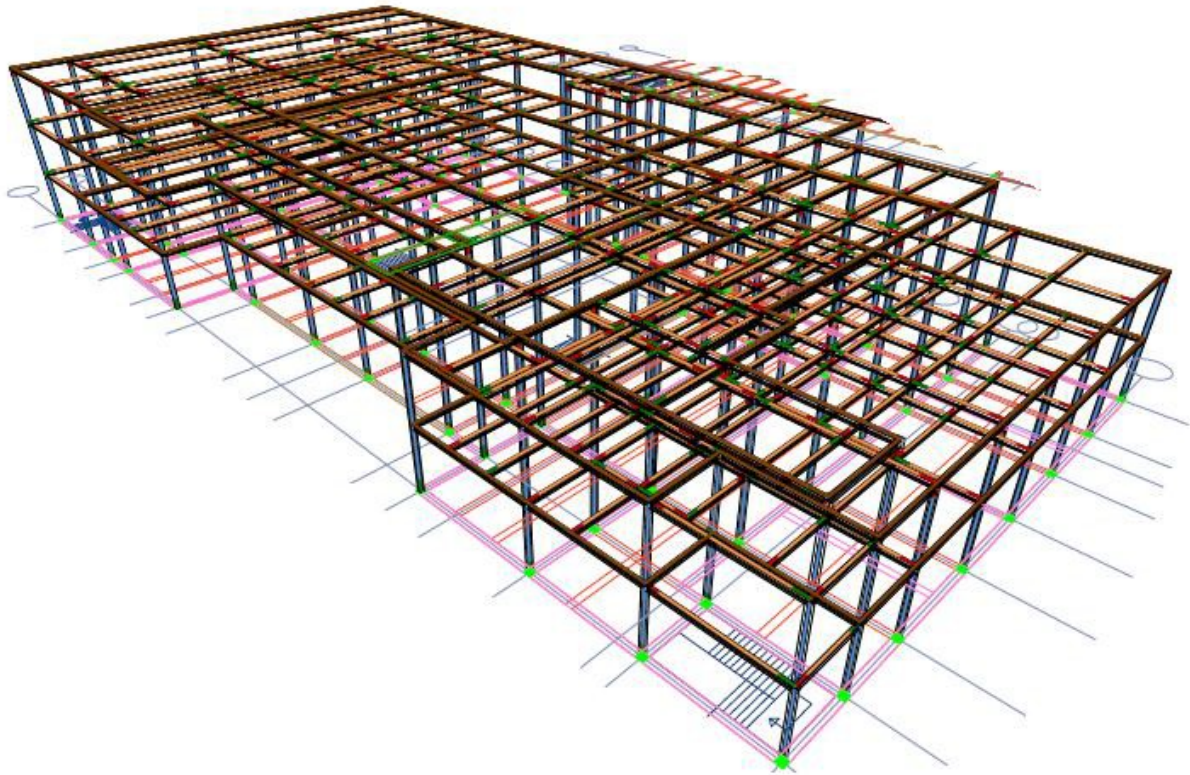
AutoCAD was used to create a 3D view of the beam layout from the north-east
